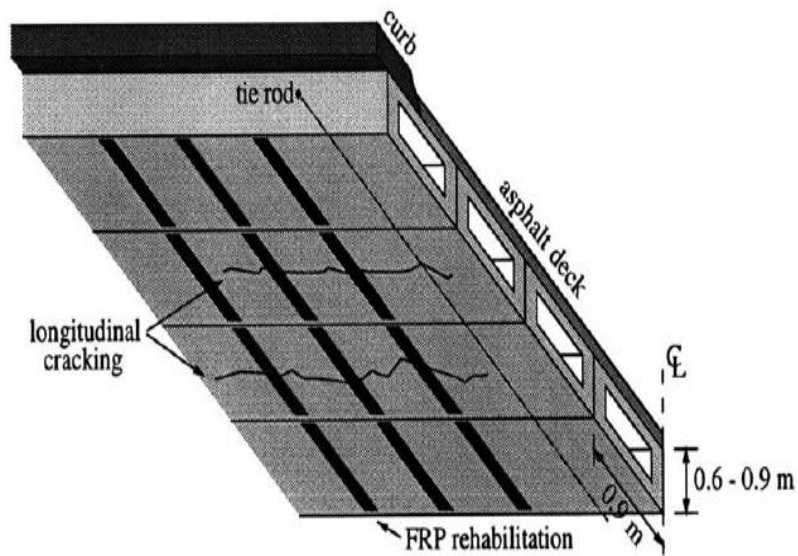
Repair of pre-stressed box beam bridge girders using tow sheets [30].
